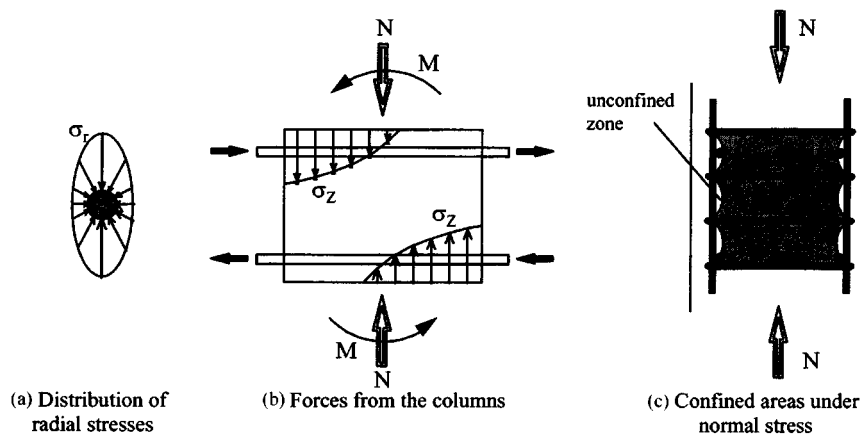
Radial stresses on bond and confinement within a beam/column joint
